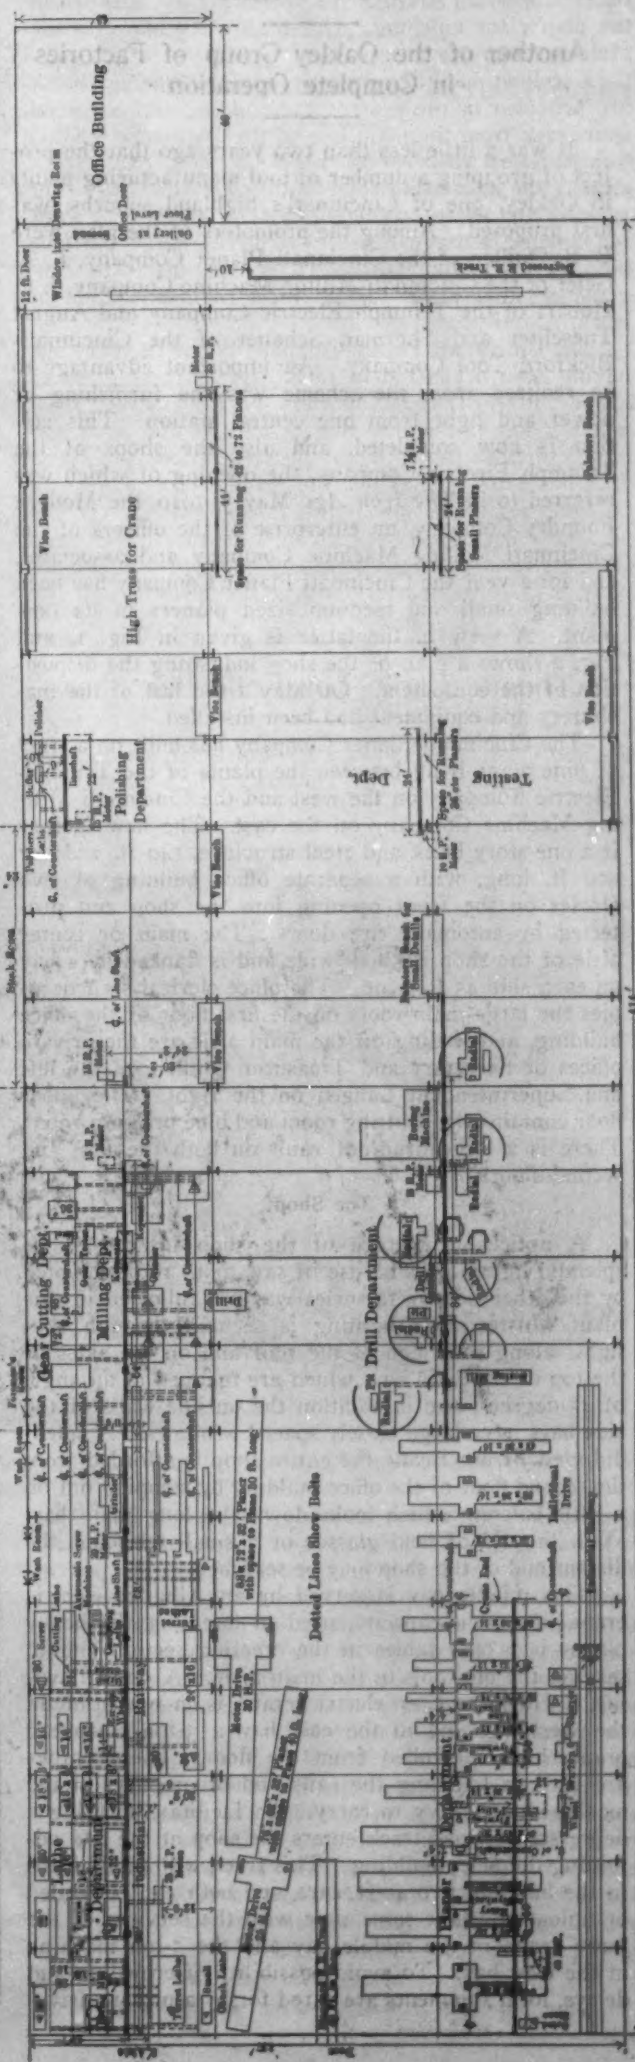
Plan of the Cincinnati Planer Company's Shop, Showing the Arrangement of Tools, Drives and Transporting Facilities.
